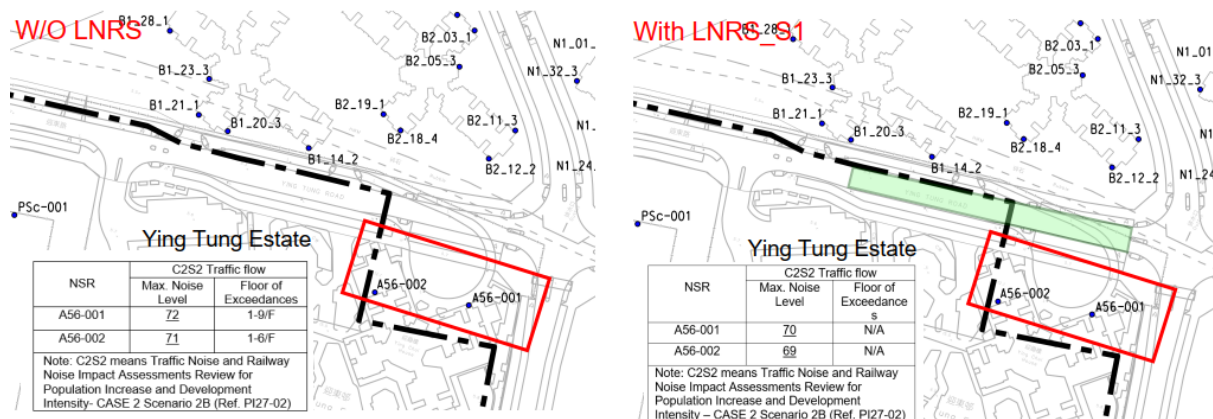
Locations and extents of the proposed LNRS at Ying Tung Road (Road L5)
